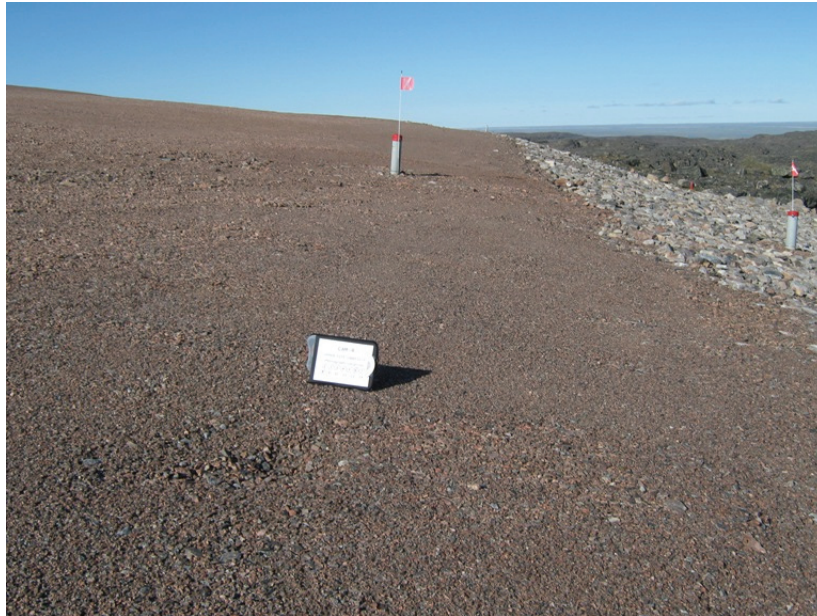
Facing north from the southeast corner of the rip-rap.____ ↑
